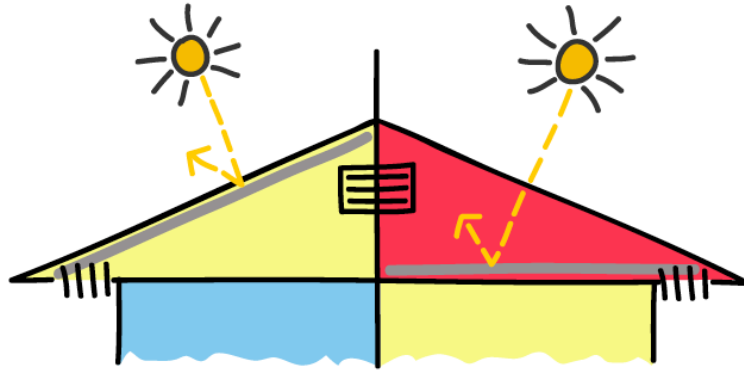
Reflective foil under the roof sheeting keeps the roof-space cooler than if placed on the ceiling
